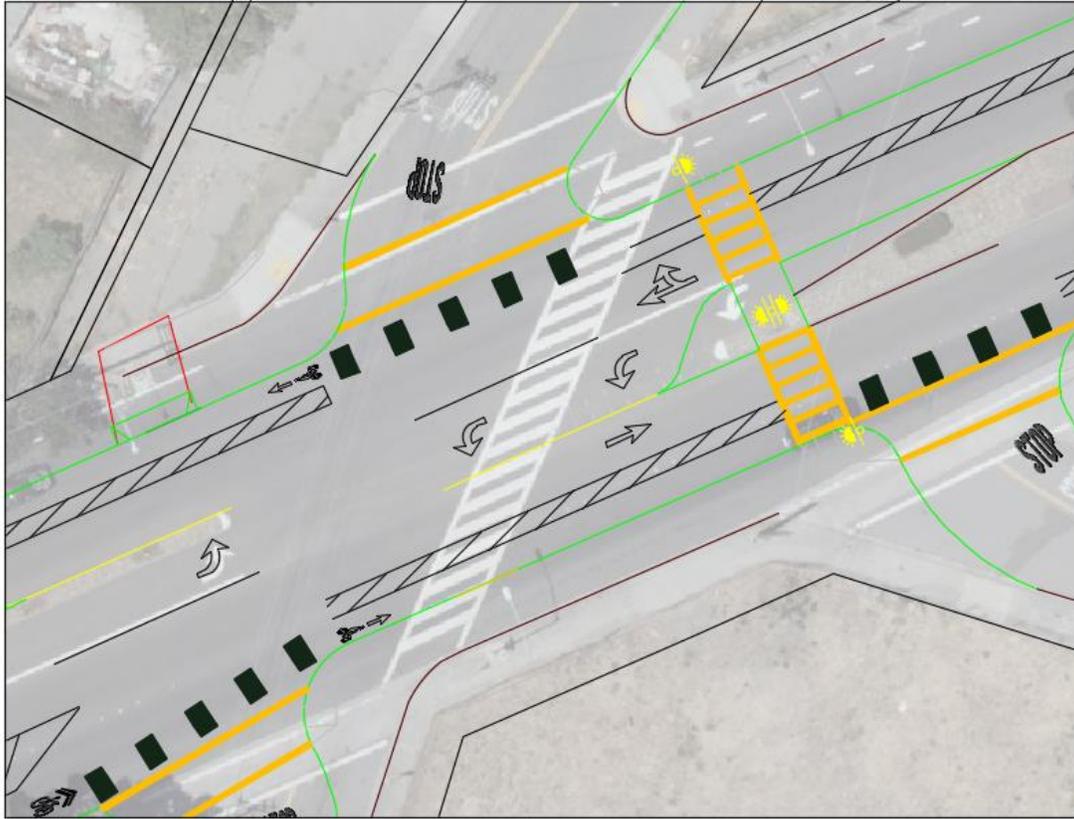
Rumrill Boulevard and 20th Street RRFBs
